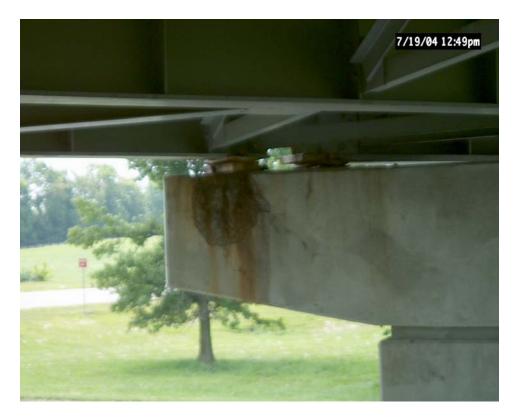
Another View of Pier Cap in Figure 16 Showing Severe Spalling/Cracking under Bearing Plate Due to Joint Leakage.
